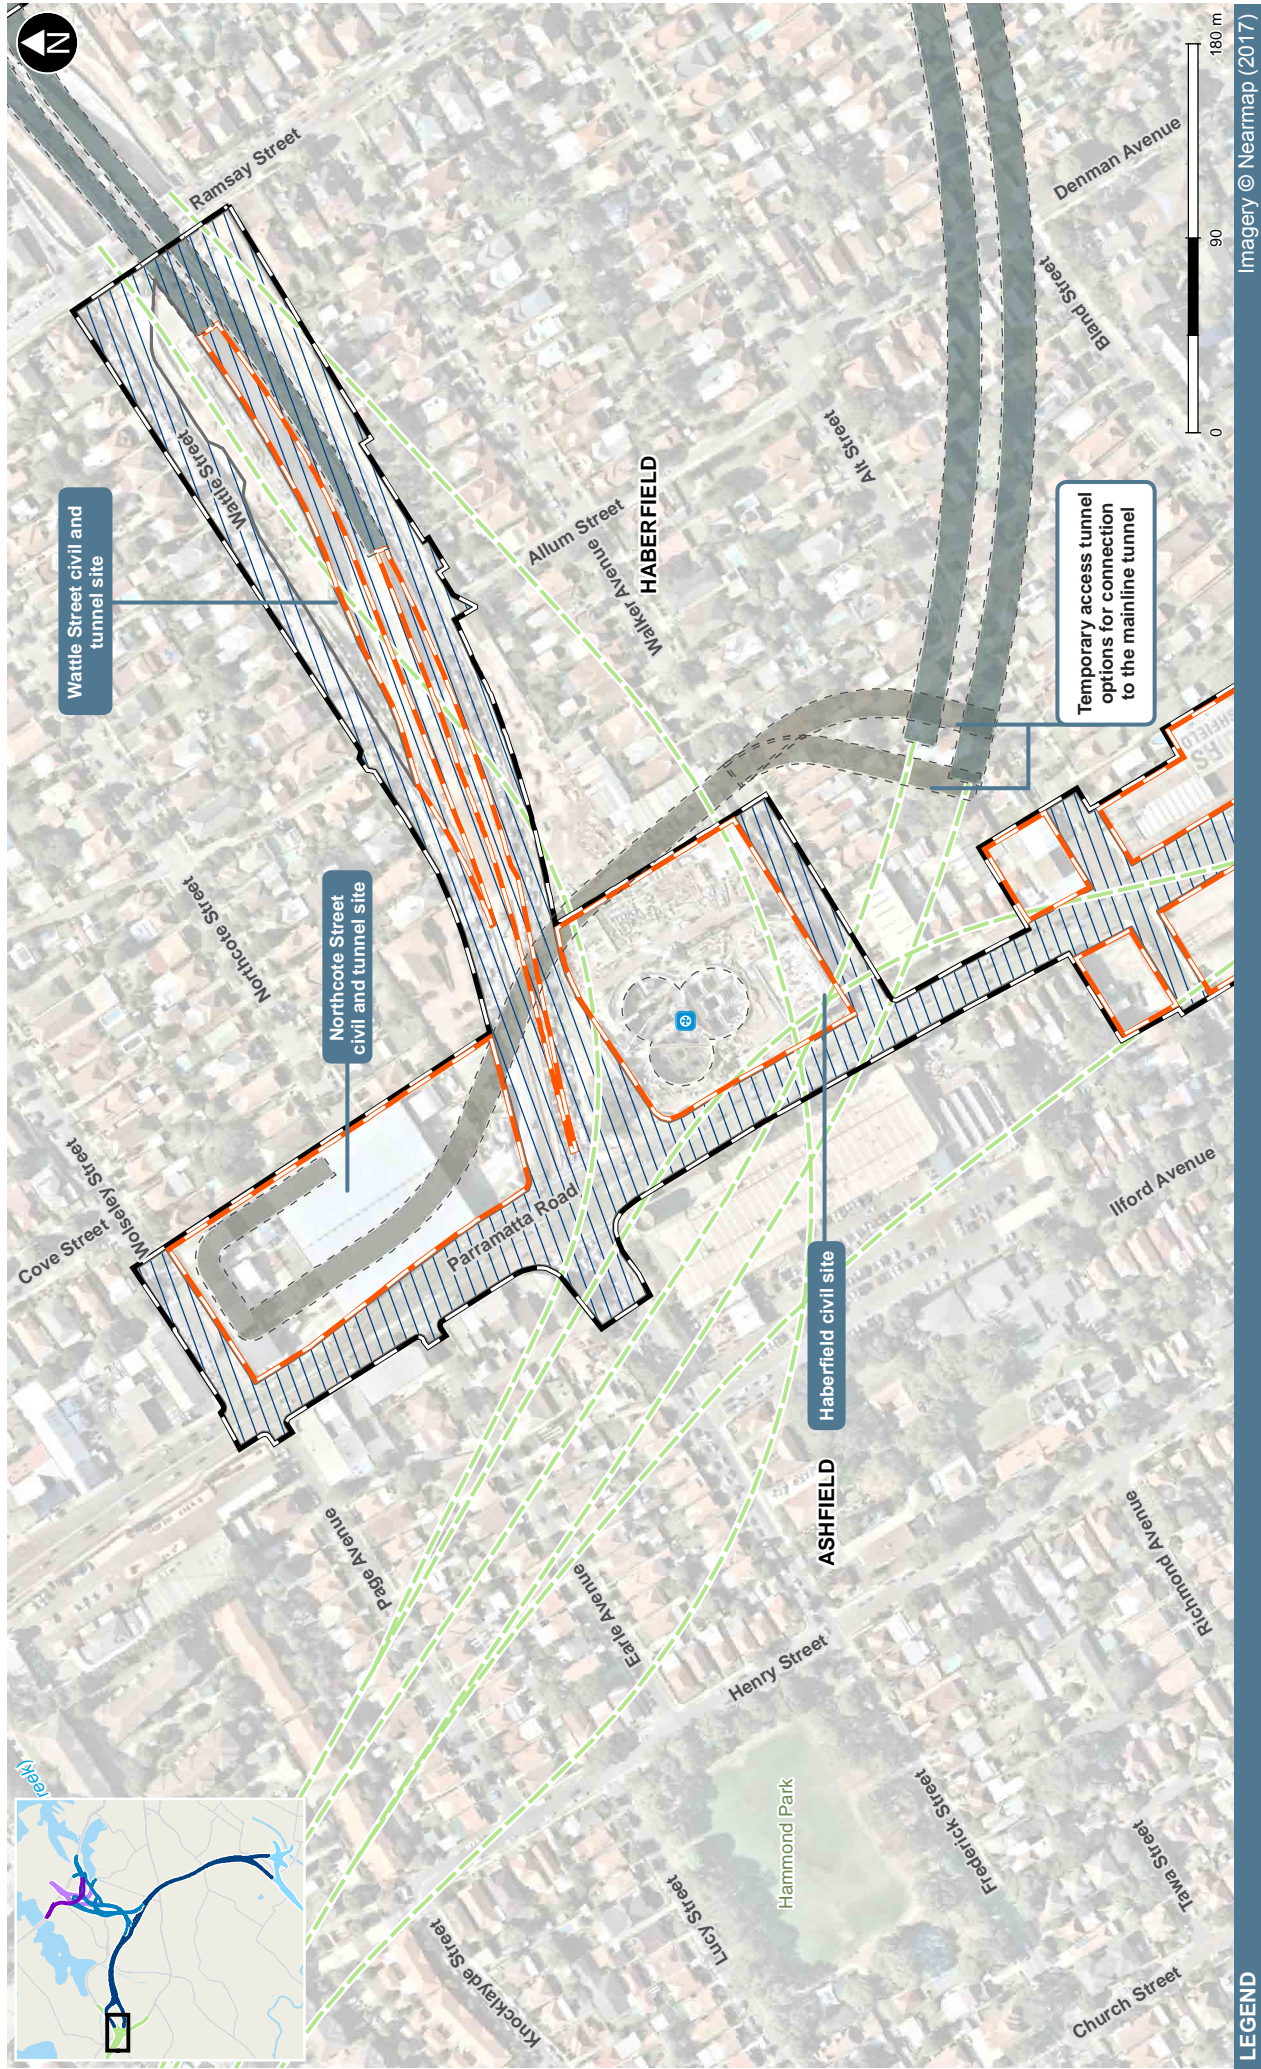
Indicative Northcote Street civil and tunnel site layout
